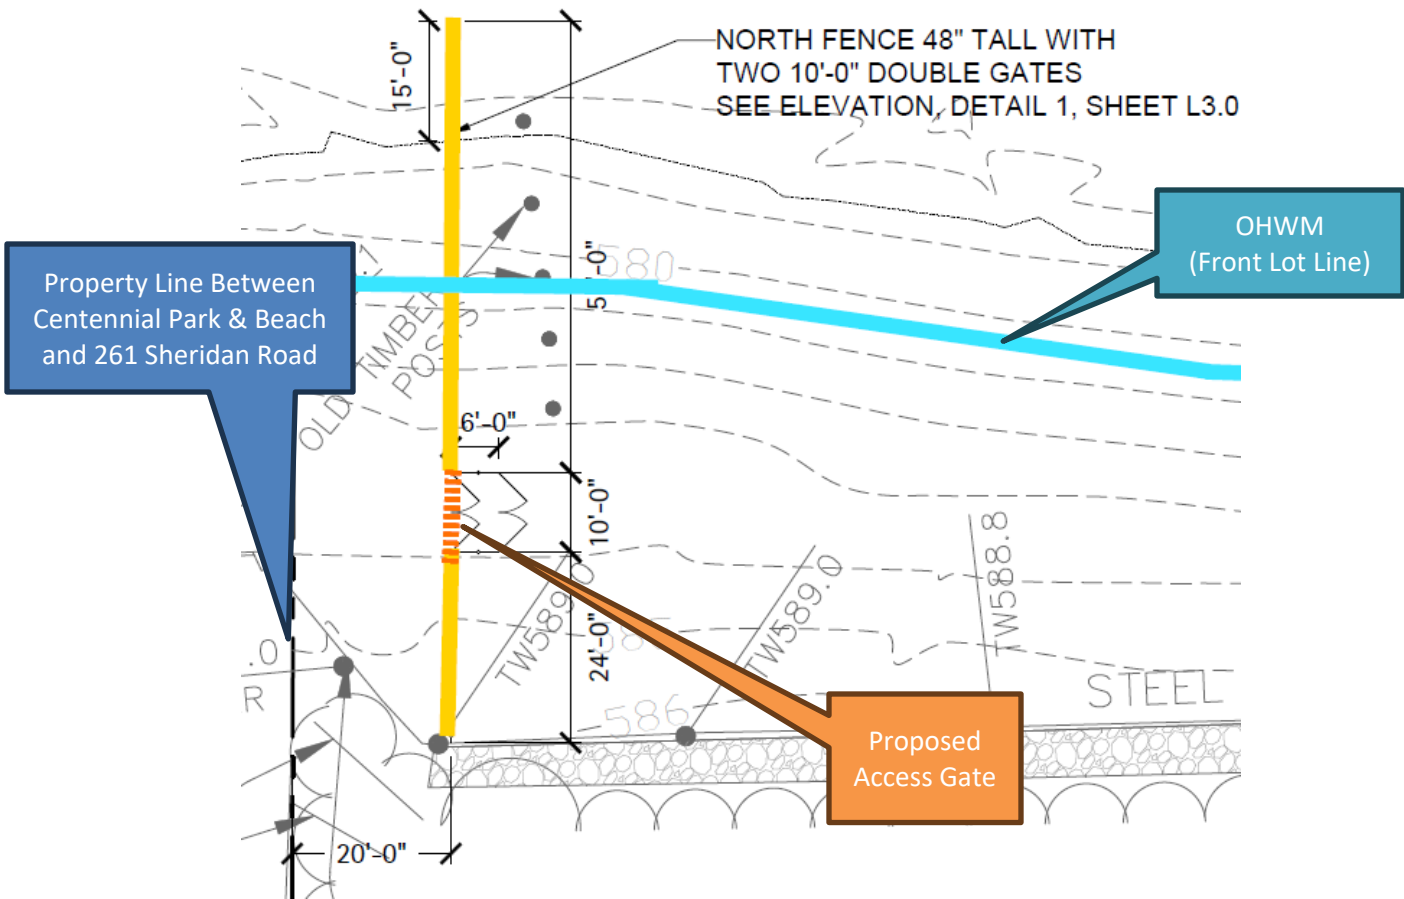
Proposed North Fence (Excerpt of Sheet L2.0)
